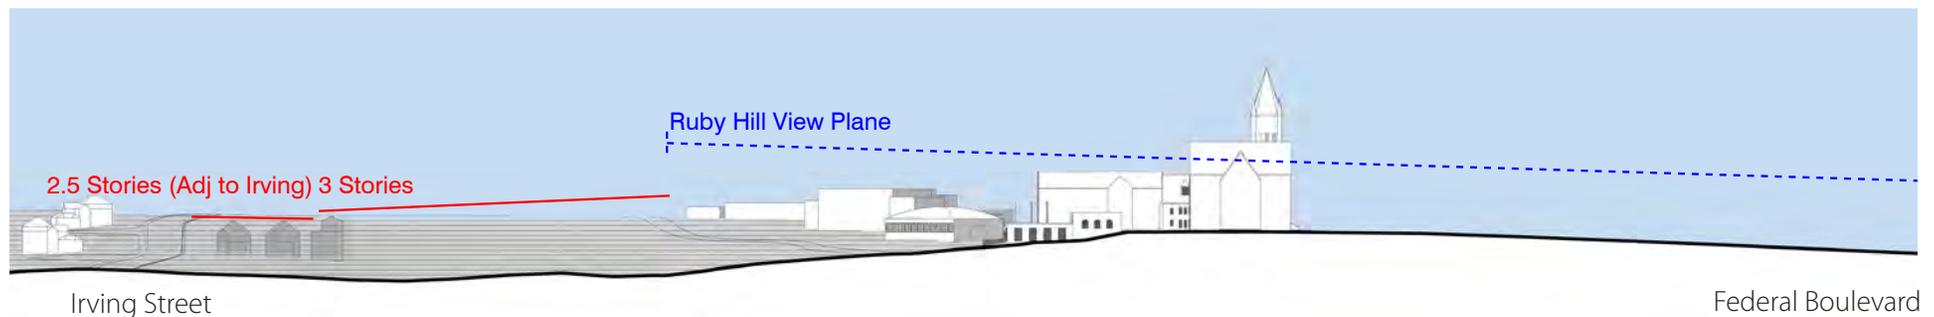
East/west cross-section of Loretto Heights campus, showing building heights and Ruby Hill Park View Plane
